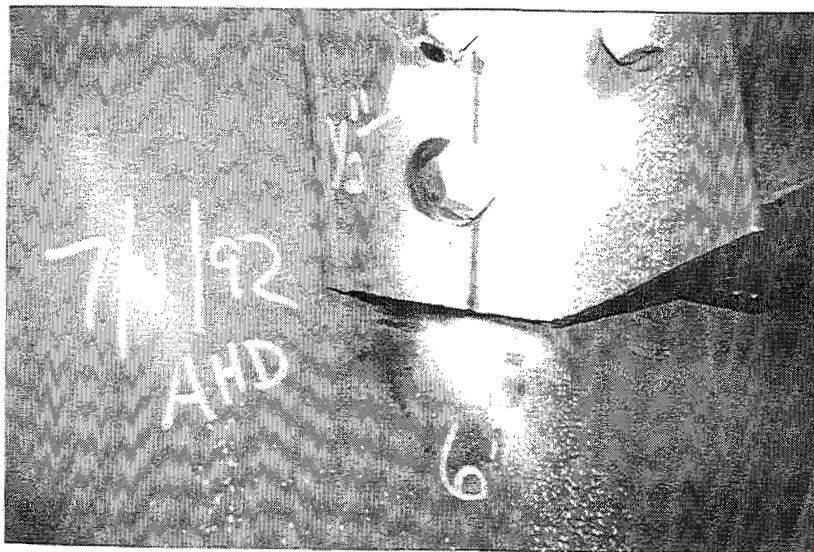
Typical Fatigue Crack in Existing Bolted Connection Angles
